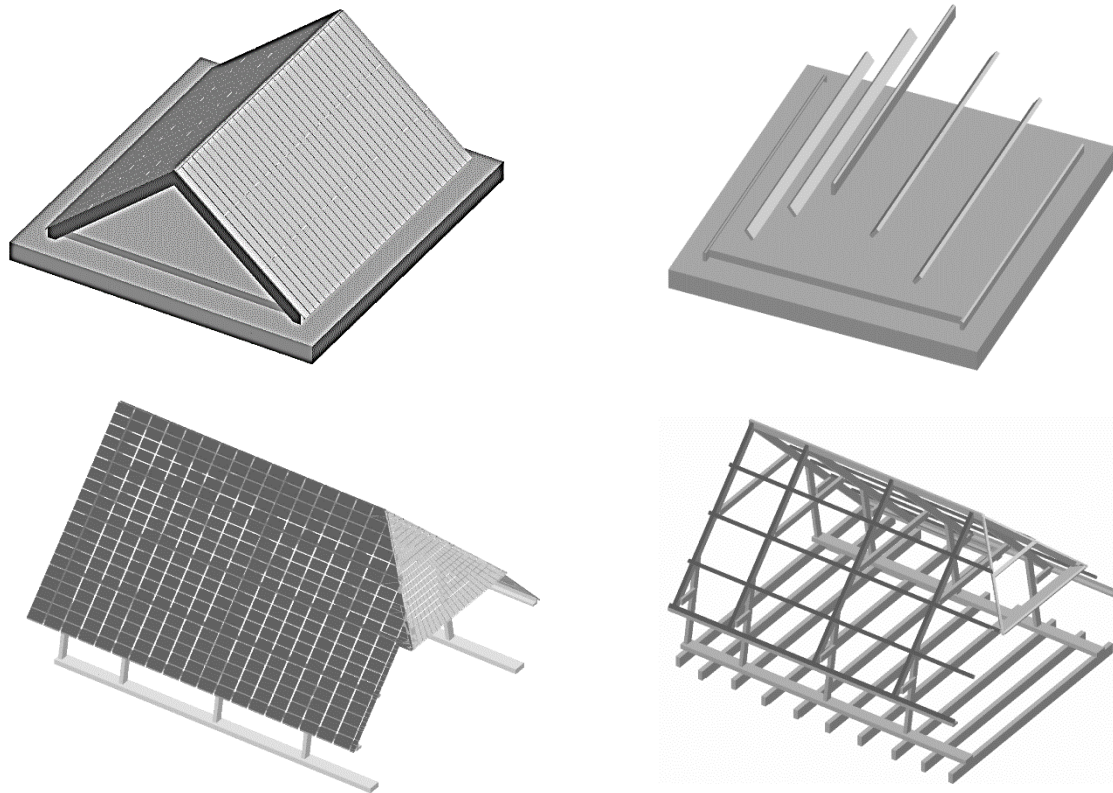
Roof structure of LNEC-BUILD2 (above) and EUC-BUILD2 (below)
